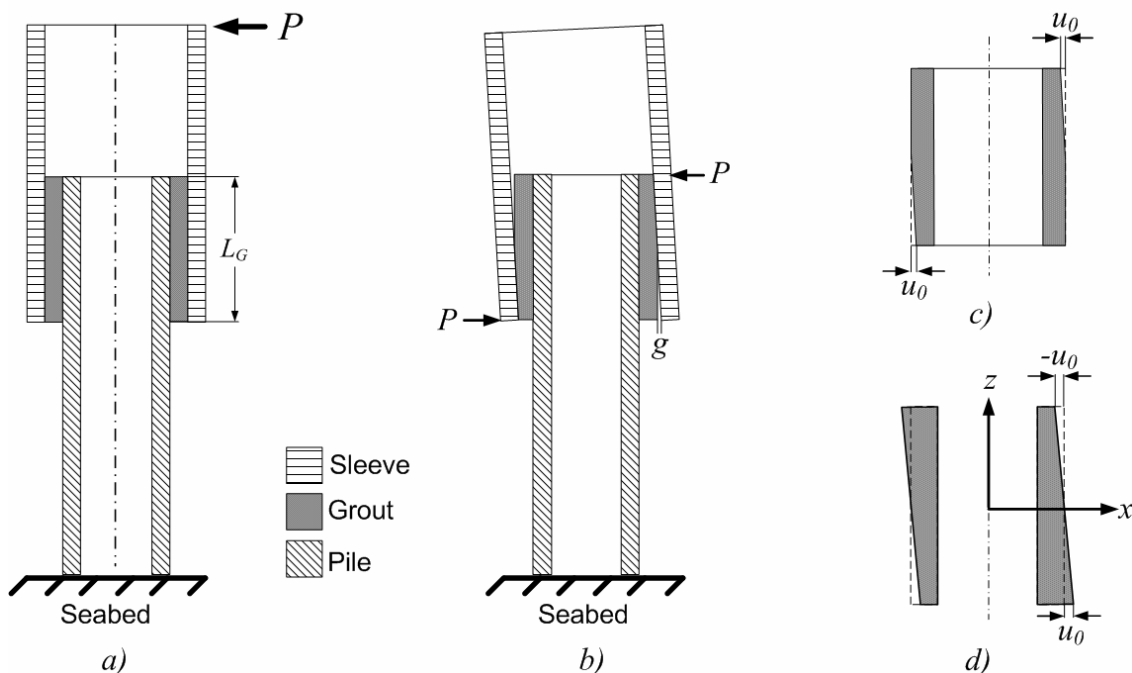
Structural behaviour of the grout due to horizontal load transfer.
